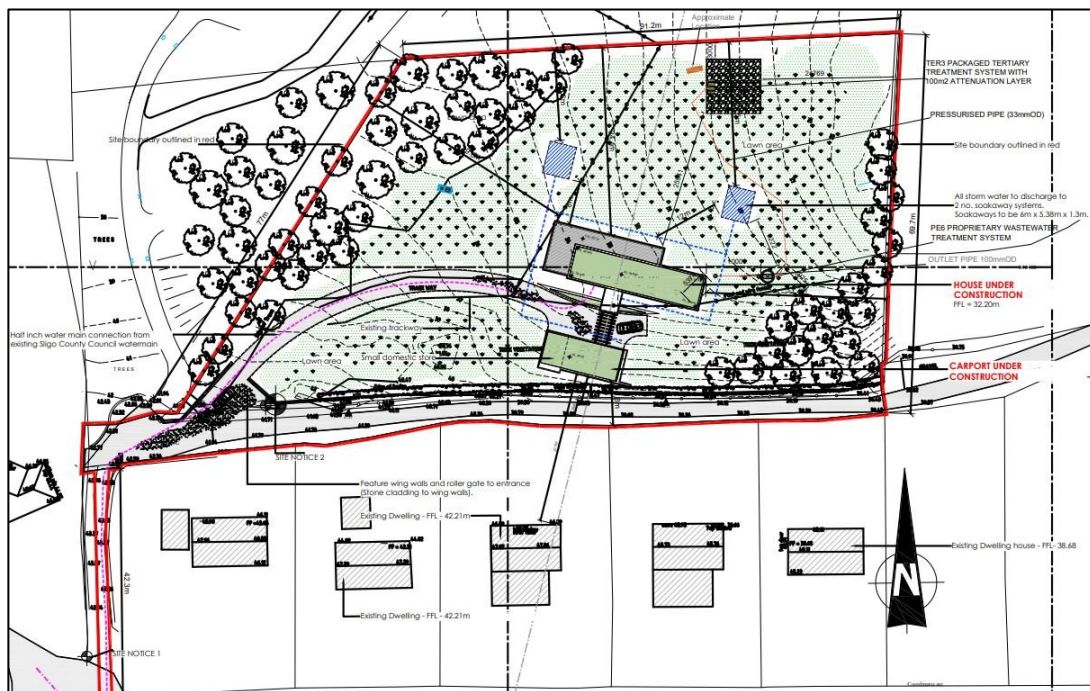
Extract from Site layout with WWTS (James Lohan Engineers).
